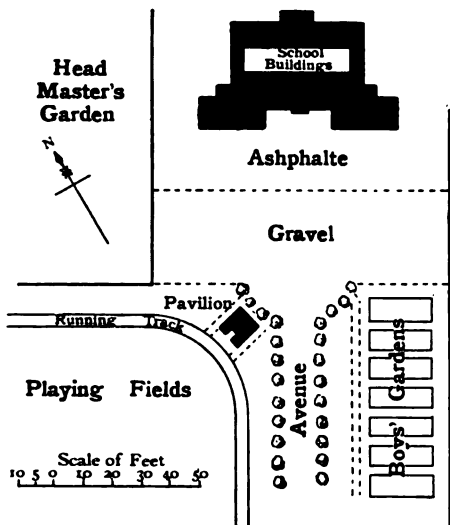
Accurate plan of school buildings and grounds. (A. E. Munby.)
